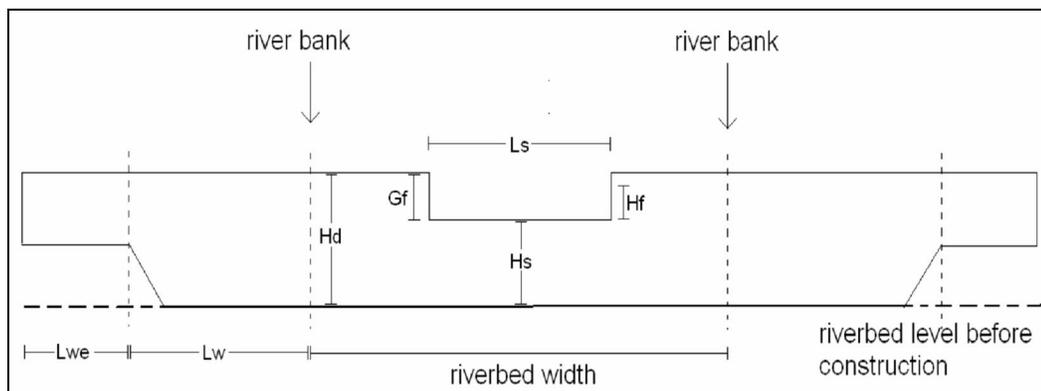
Cross-sectional width dimensions for a typical sand dam construction
